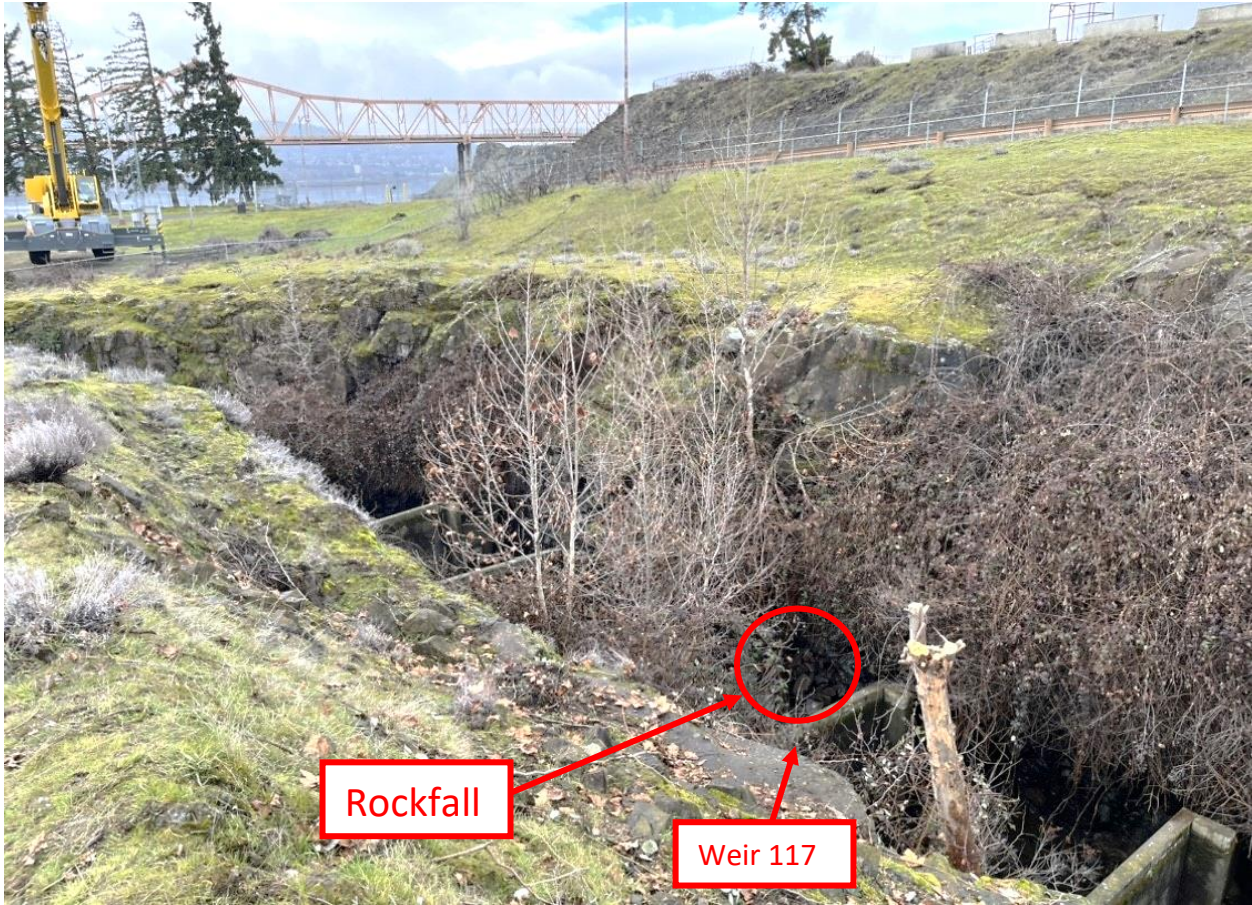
Looking west from top of rock cut (looking toward south-facing wall) at north fish ladder, looking toward weirs 114 through 118 (from left to right, weir 116 is not visible in this photo).
